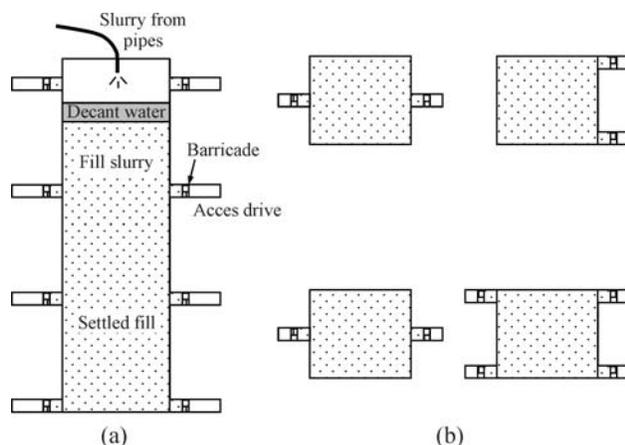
Schematic diagram of a mine stope with access drains: (a) front view of a stope; (b) possible drain layouts in plan view.
